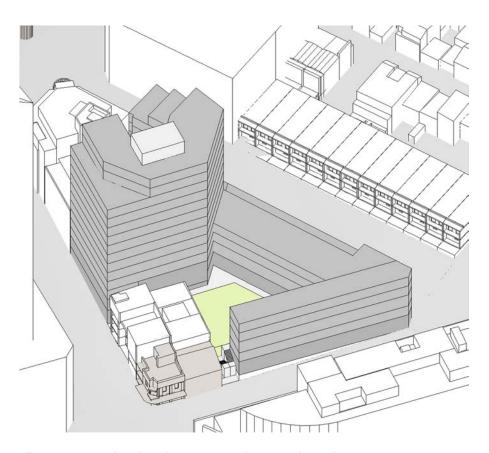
aerial view from north of alternative mixed use scheme at 13a-29 Union Street
